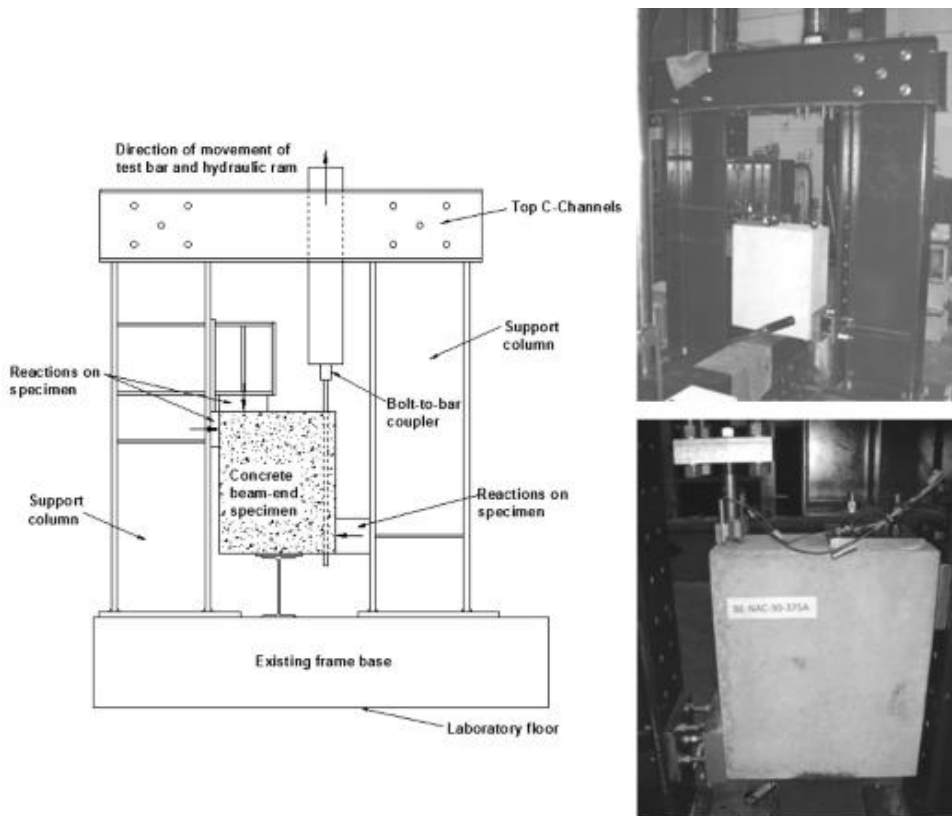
Beam-end test setup configuration, completed test frame and a typical beam-end specimen (Butler *et al.*, 2011)
